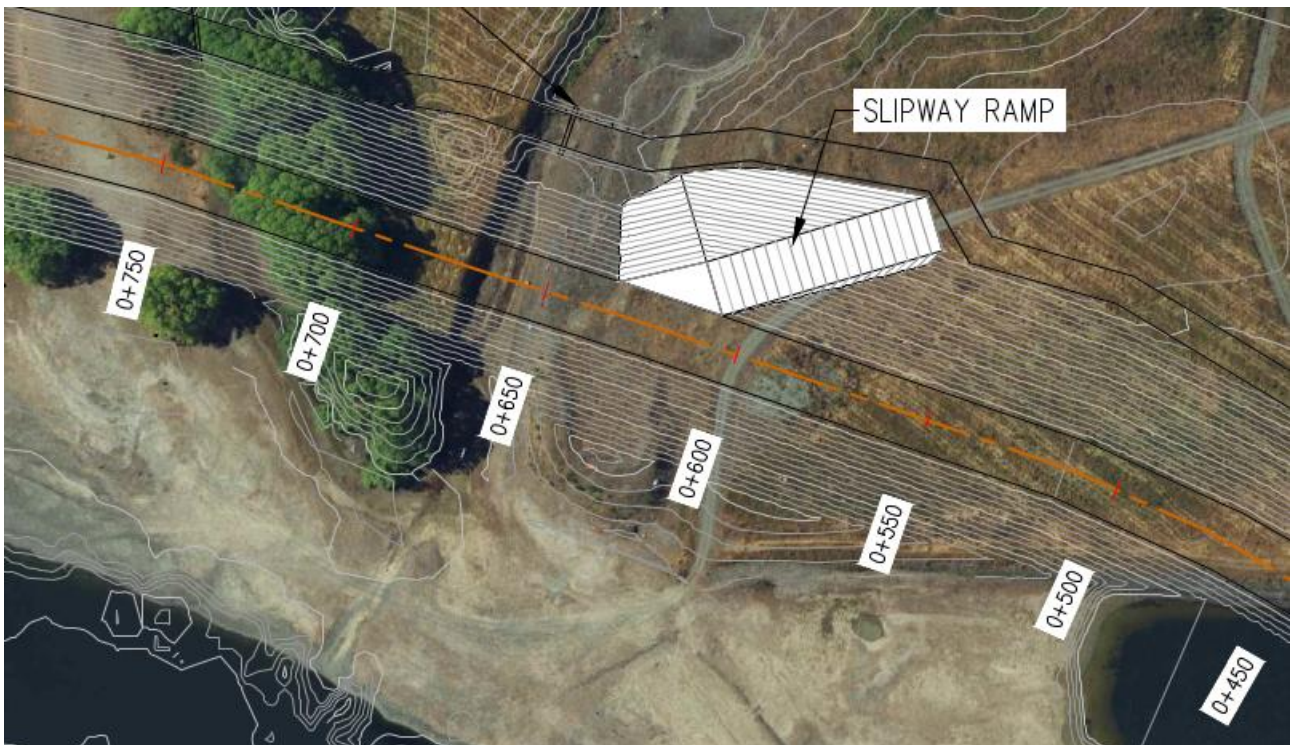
Excavated ramp to provide for temporary haul-out slipway (indicative location)
